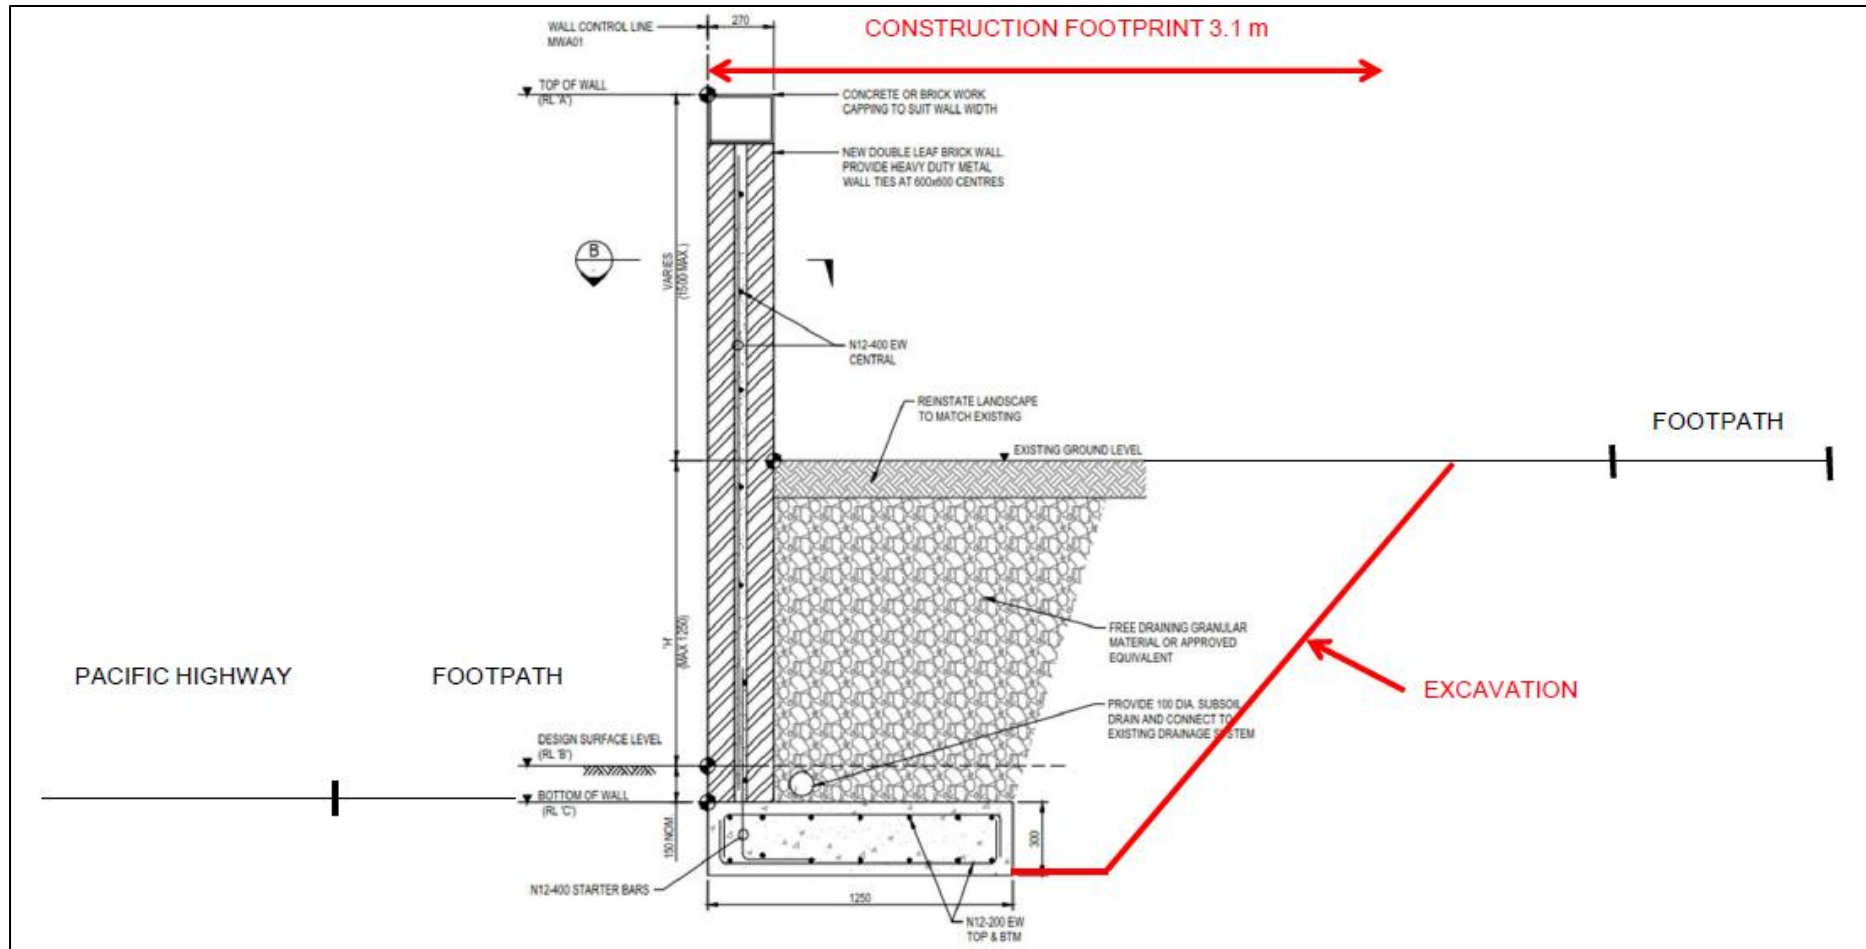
Section drawing of proposed pad footing retaining wall (Source: Roads and Maritime Services, 2018)
